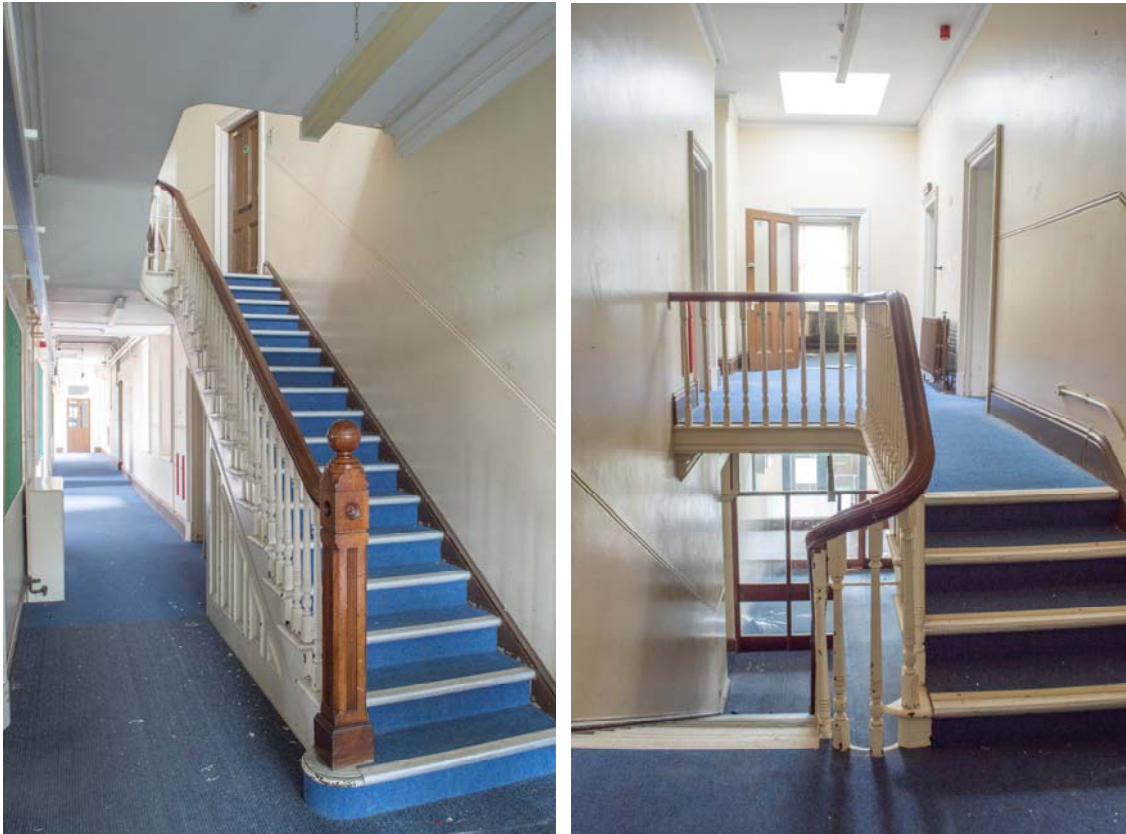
Building 20: commander's quarters, views of main stair (SGA15-415 & 498)
